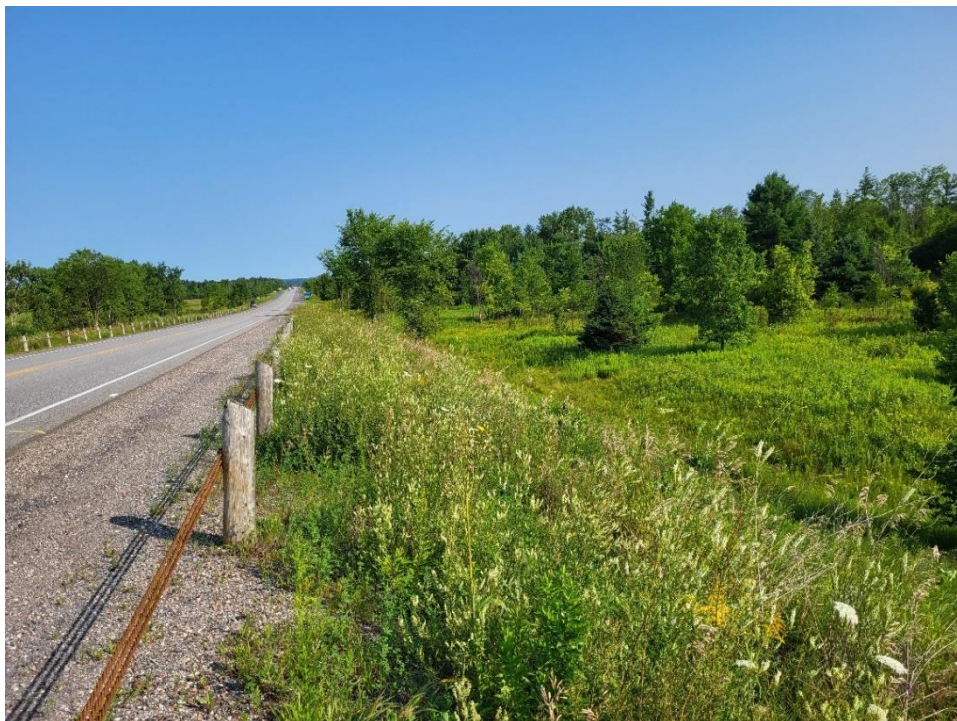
Looking northwest along Highway 17 westbound embankment (July 26, 2024)
